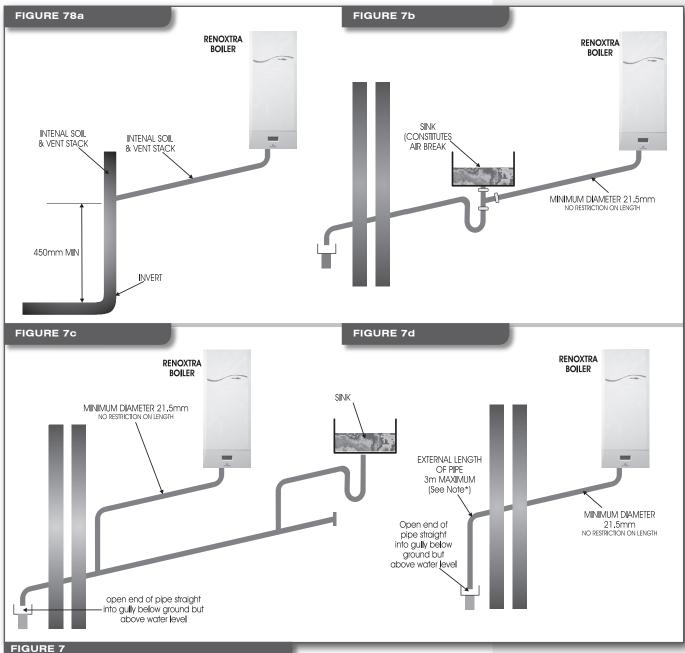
TYPICAL CONDENSATE DRAIN ARRANGEMENTS
